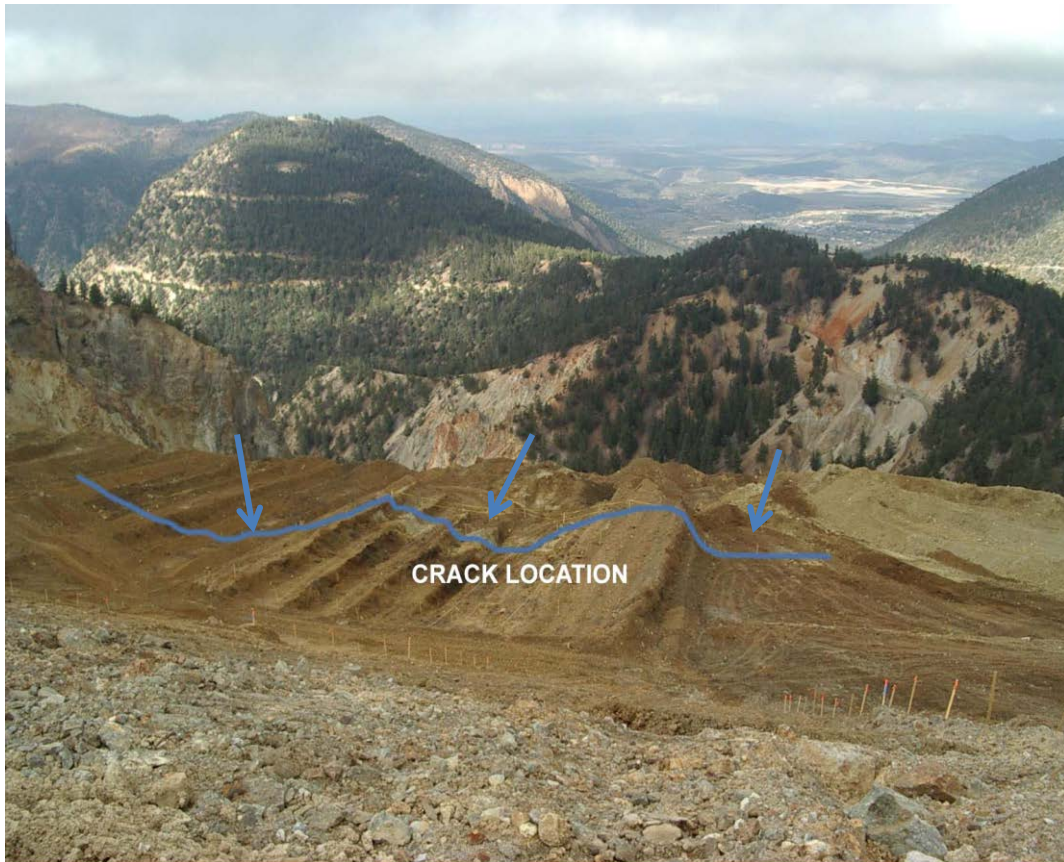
Location of the crack as viewed from up the 2:1 slope (crack highlighted by thick blue line)
